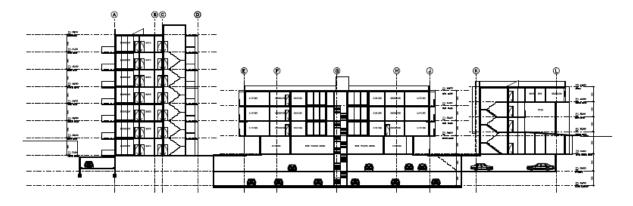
Section drawing through Buildings 1, 2 and 3 of proposed development
